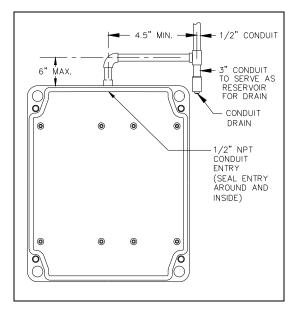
Top entry conduit installation details for metallic enclosures (NOT recommended)
